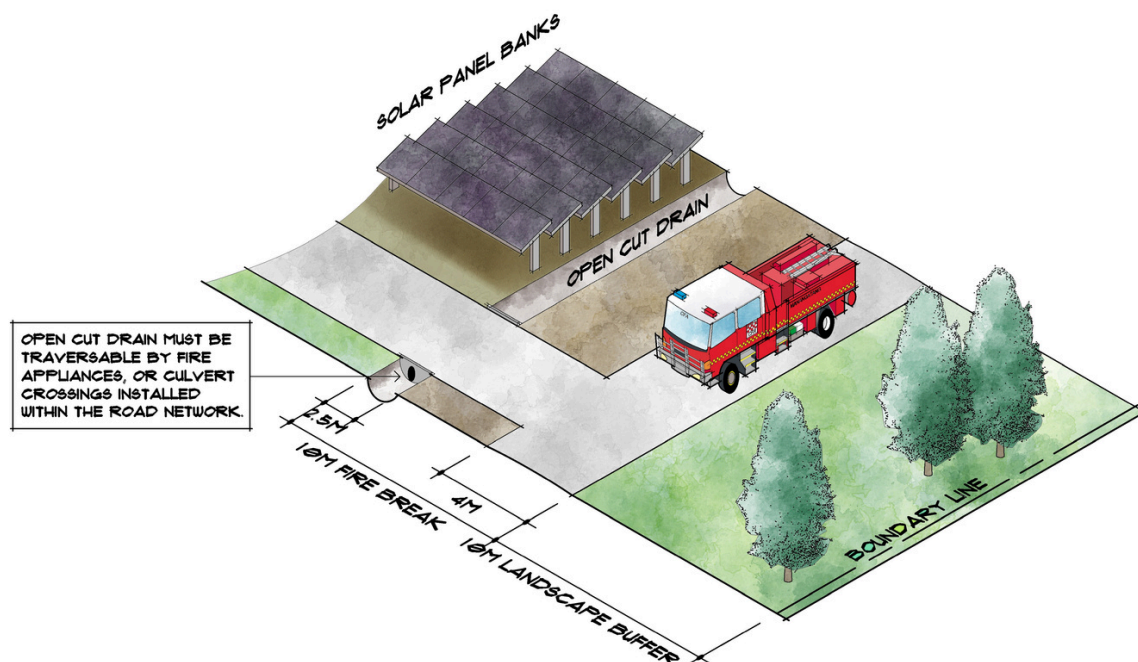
Typical cross-section indicating fire break requirements at a solar energy facility.
